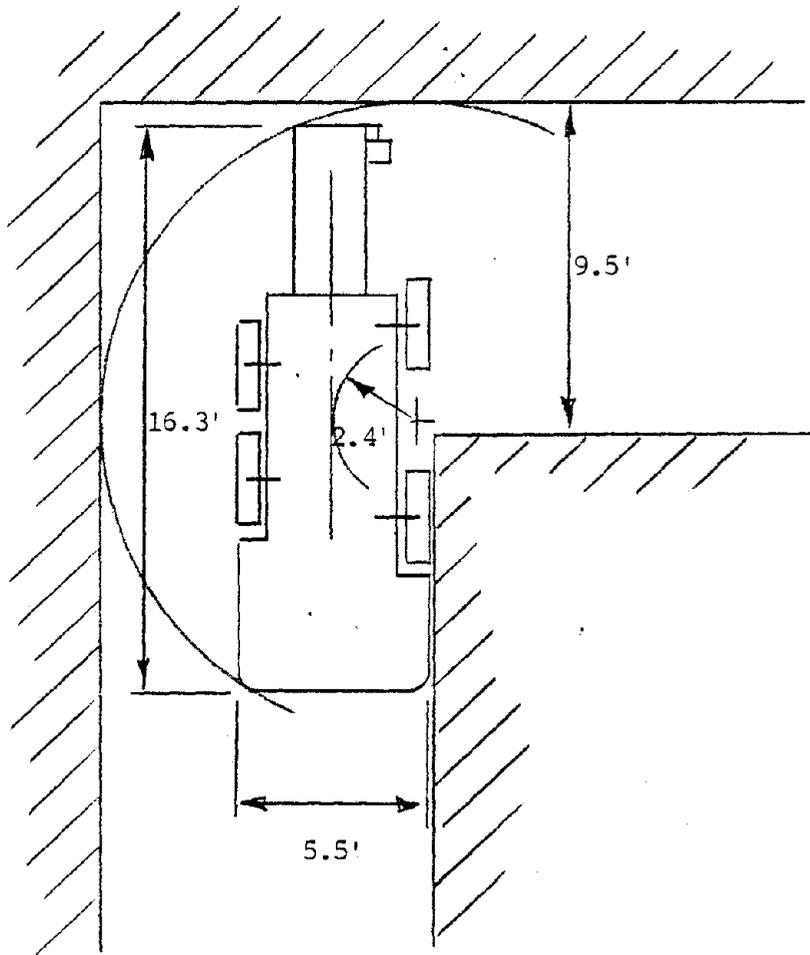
Minimum Entry Width for 90° Single Pass Turn Transfer Bolter Single Boom (New Chassis)
